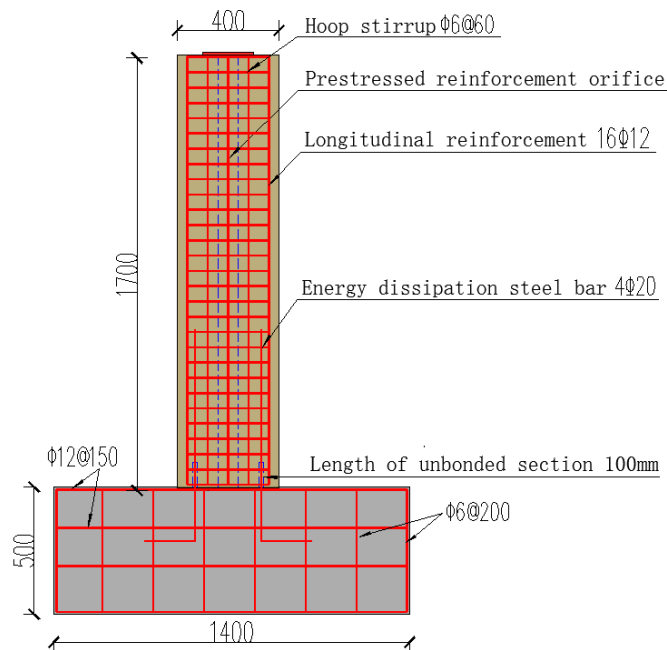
Reinforcement Diagram of Pier with Additional Mild Steel Damper
